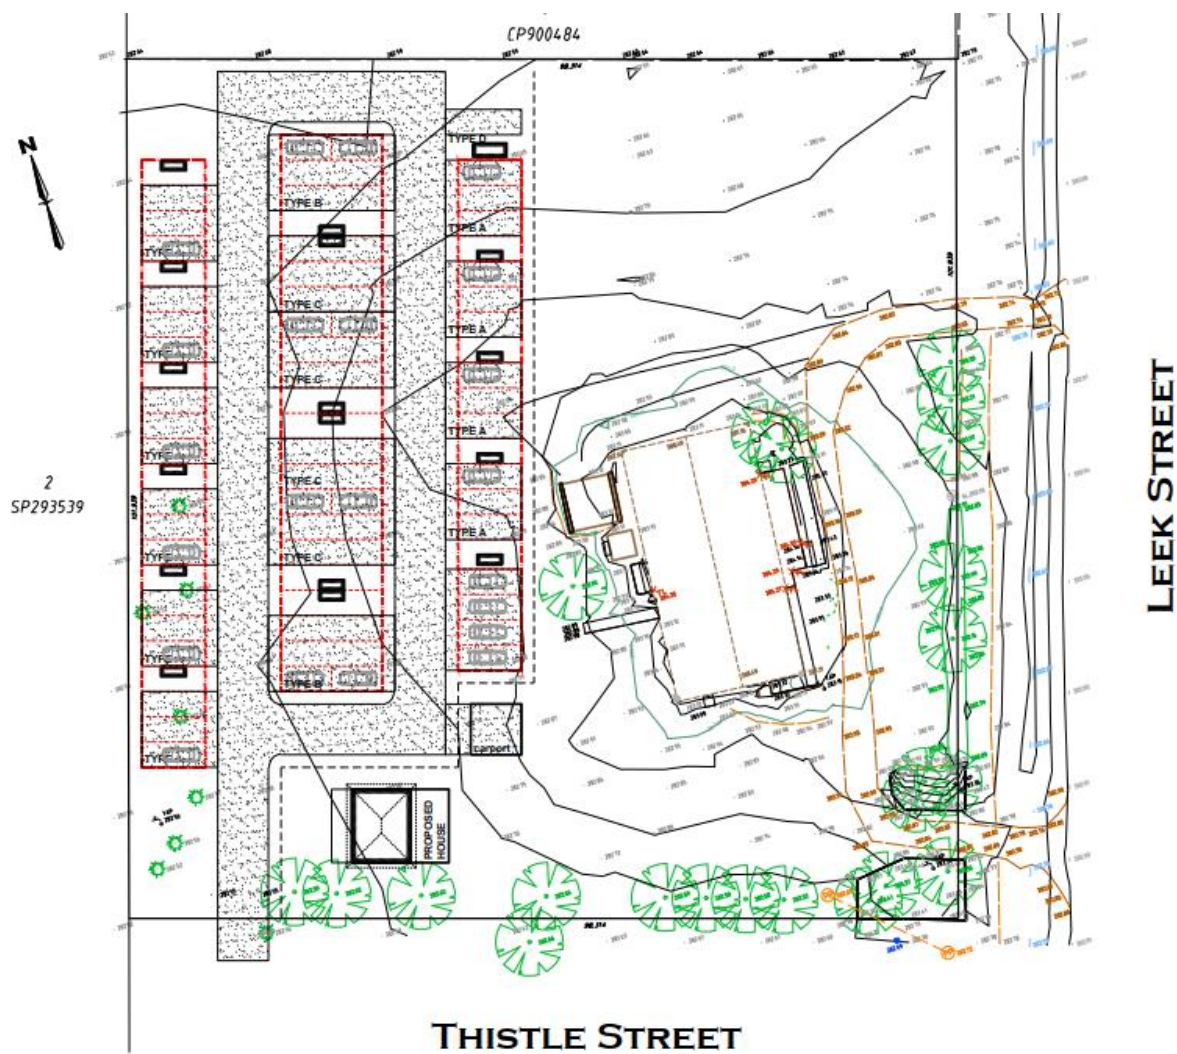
Reconfiguration Layout (Source: Extract from approved plans)
